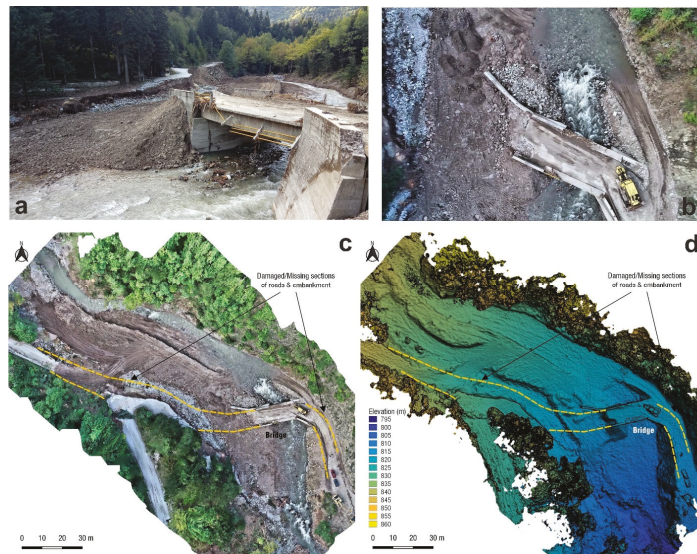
Damaged bridge crossing of Karitsiotis River near Belokomiti. Ground (a) and vertical aerial (b) images of the damaged bridge undergoing repairs on 1 October 2020. UAS orthophoto (c) and digital surface model (d) of the Karitsiotis River bridge area (surveys 1 October 2020).
